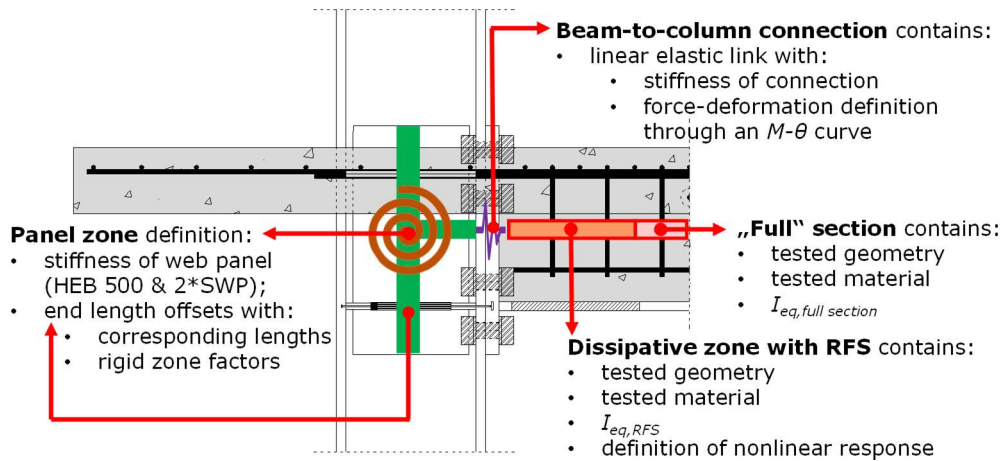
Illustration of the SF beam-to-column joint modelling of the *MRF-SF
